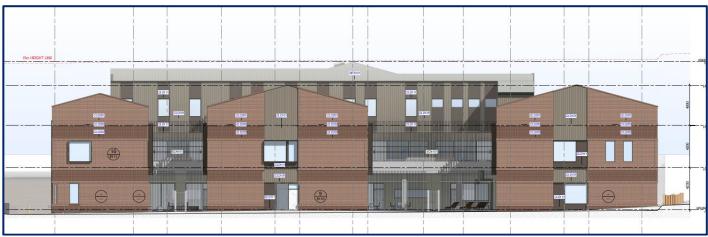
Eastern elevation showing the approved development (courtesy: NBRS, 2023)
